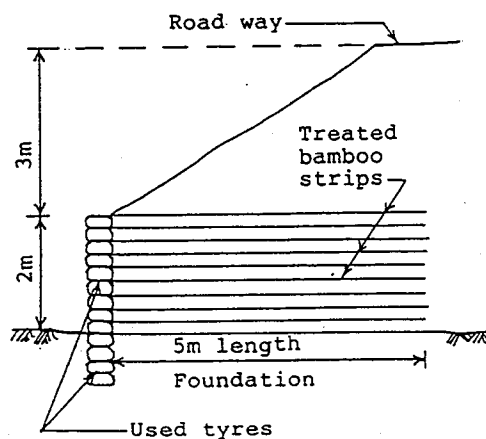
Reinforced earth retaining wall between 19/6 & 19/8 R-W Road
